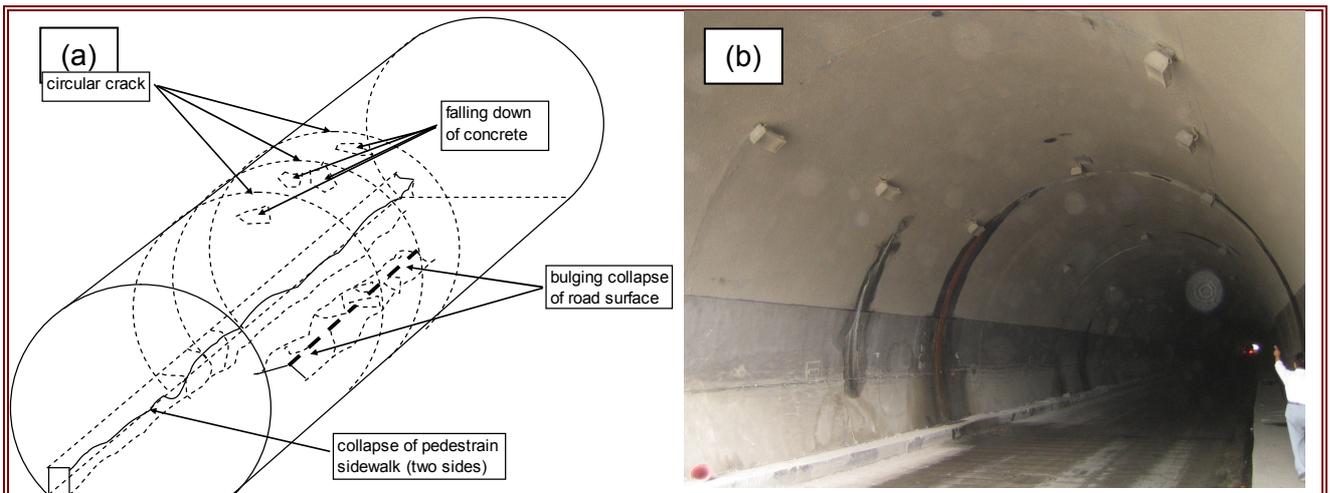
Damage to Friendship Tunnel (Youyi Tunnel) (a) Location and types of damage including bulging of the invert, spalling from the roof, longitudinal cracks at the axis and knee and cracks and b) circumferential cracks in sprayed concrete lining.
